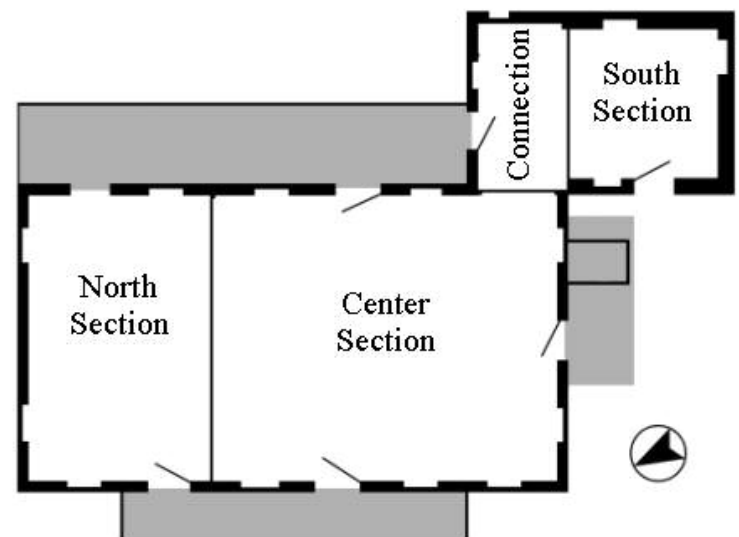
Floorplan of house as it appeared following the additions of c. 1845.
